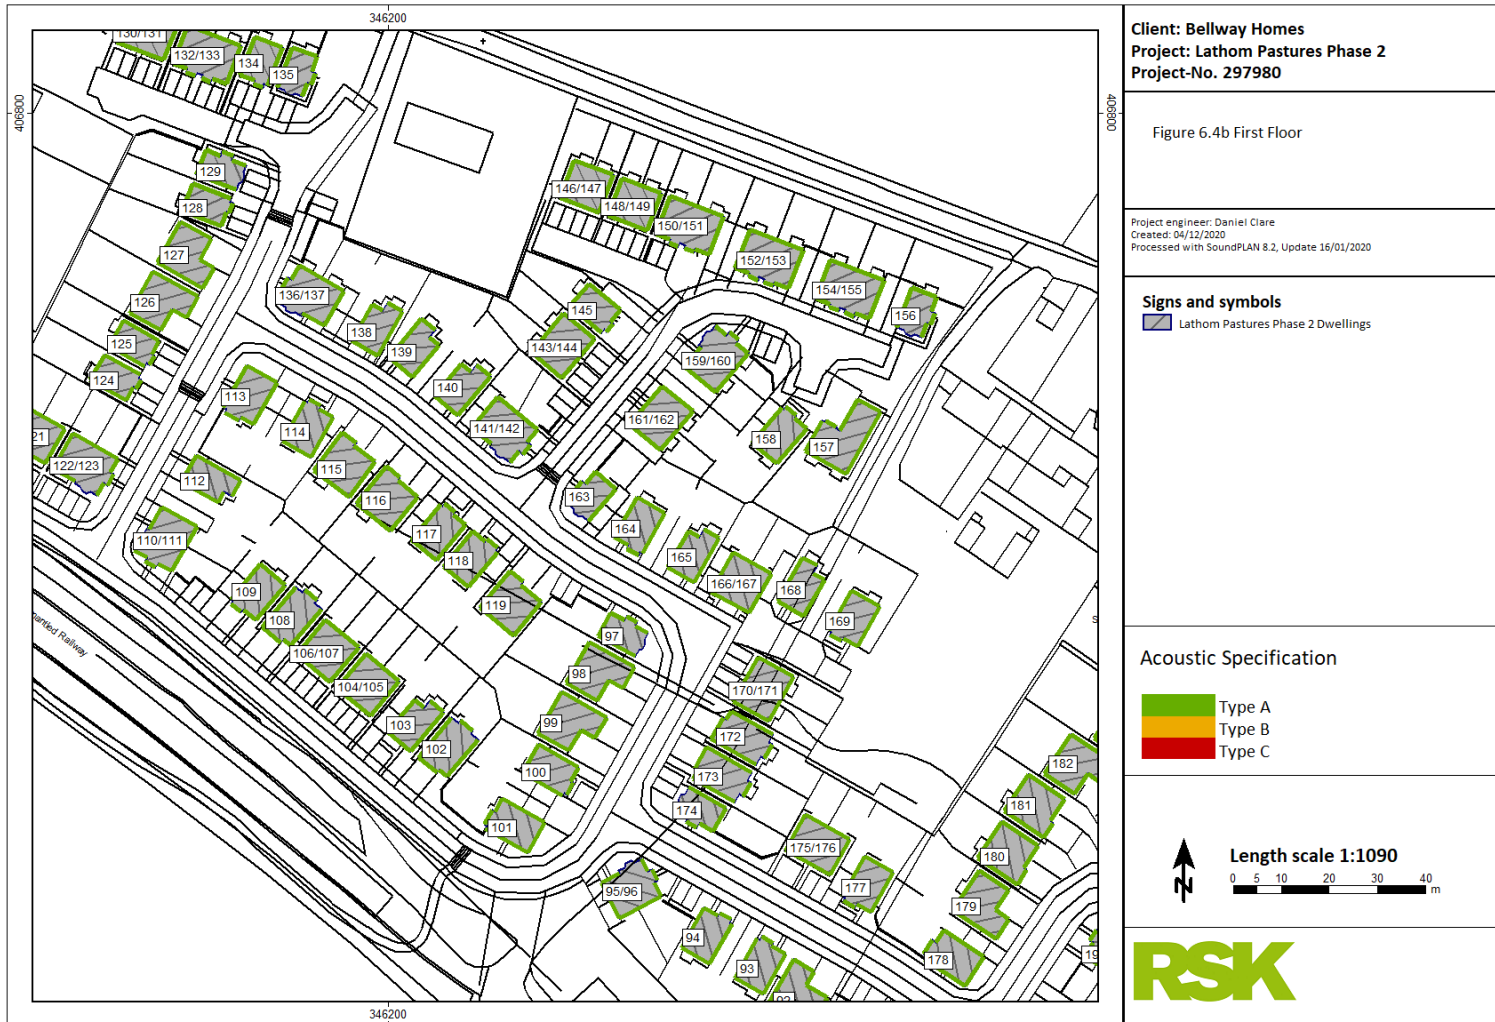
Indicative Façade Specifications (First Floor) – Plots 97-182
